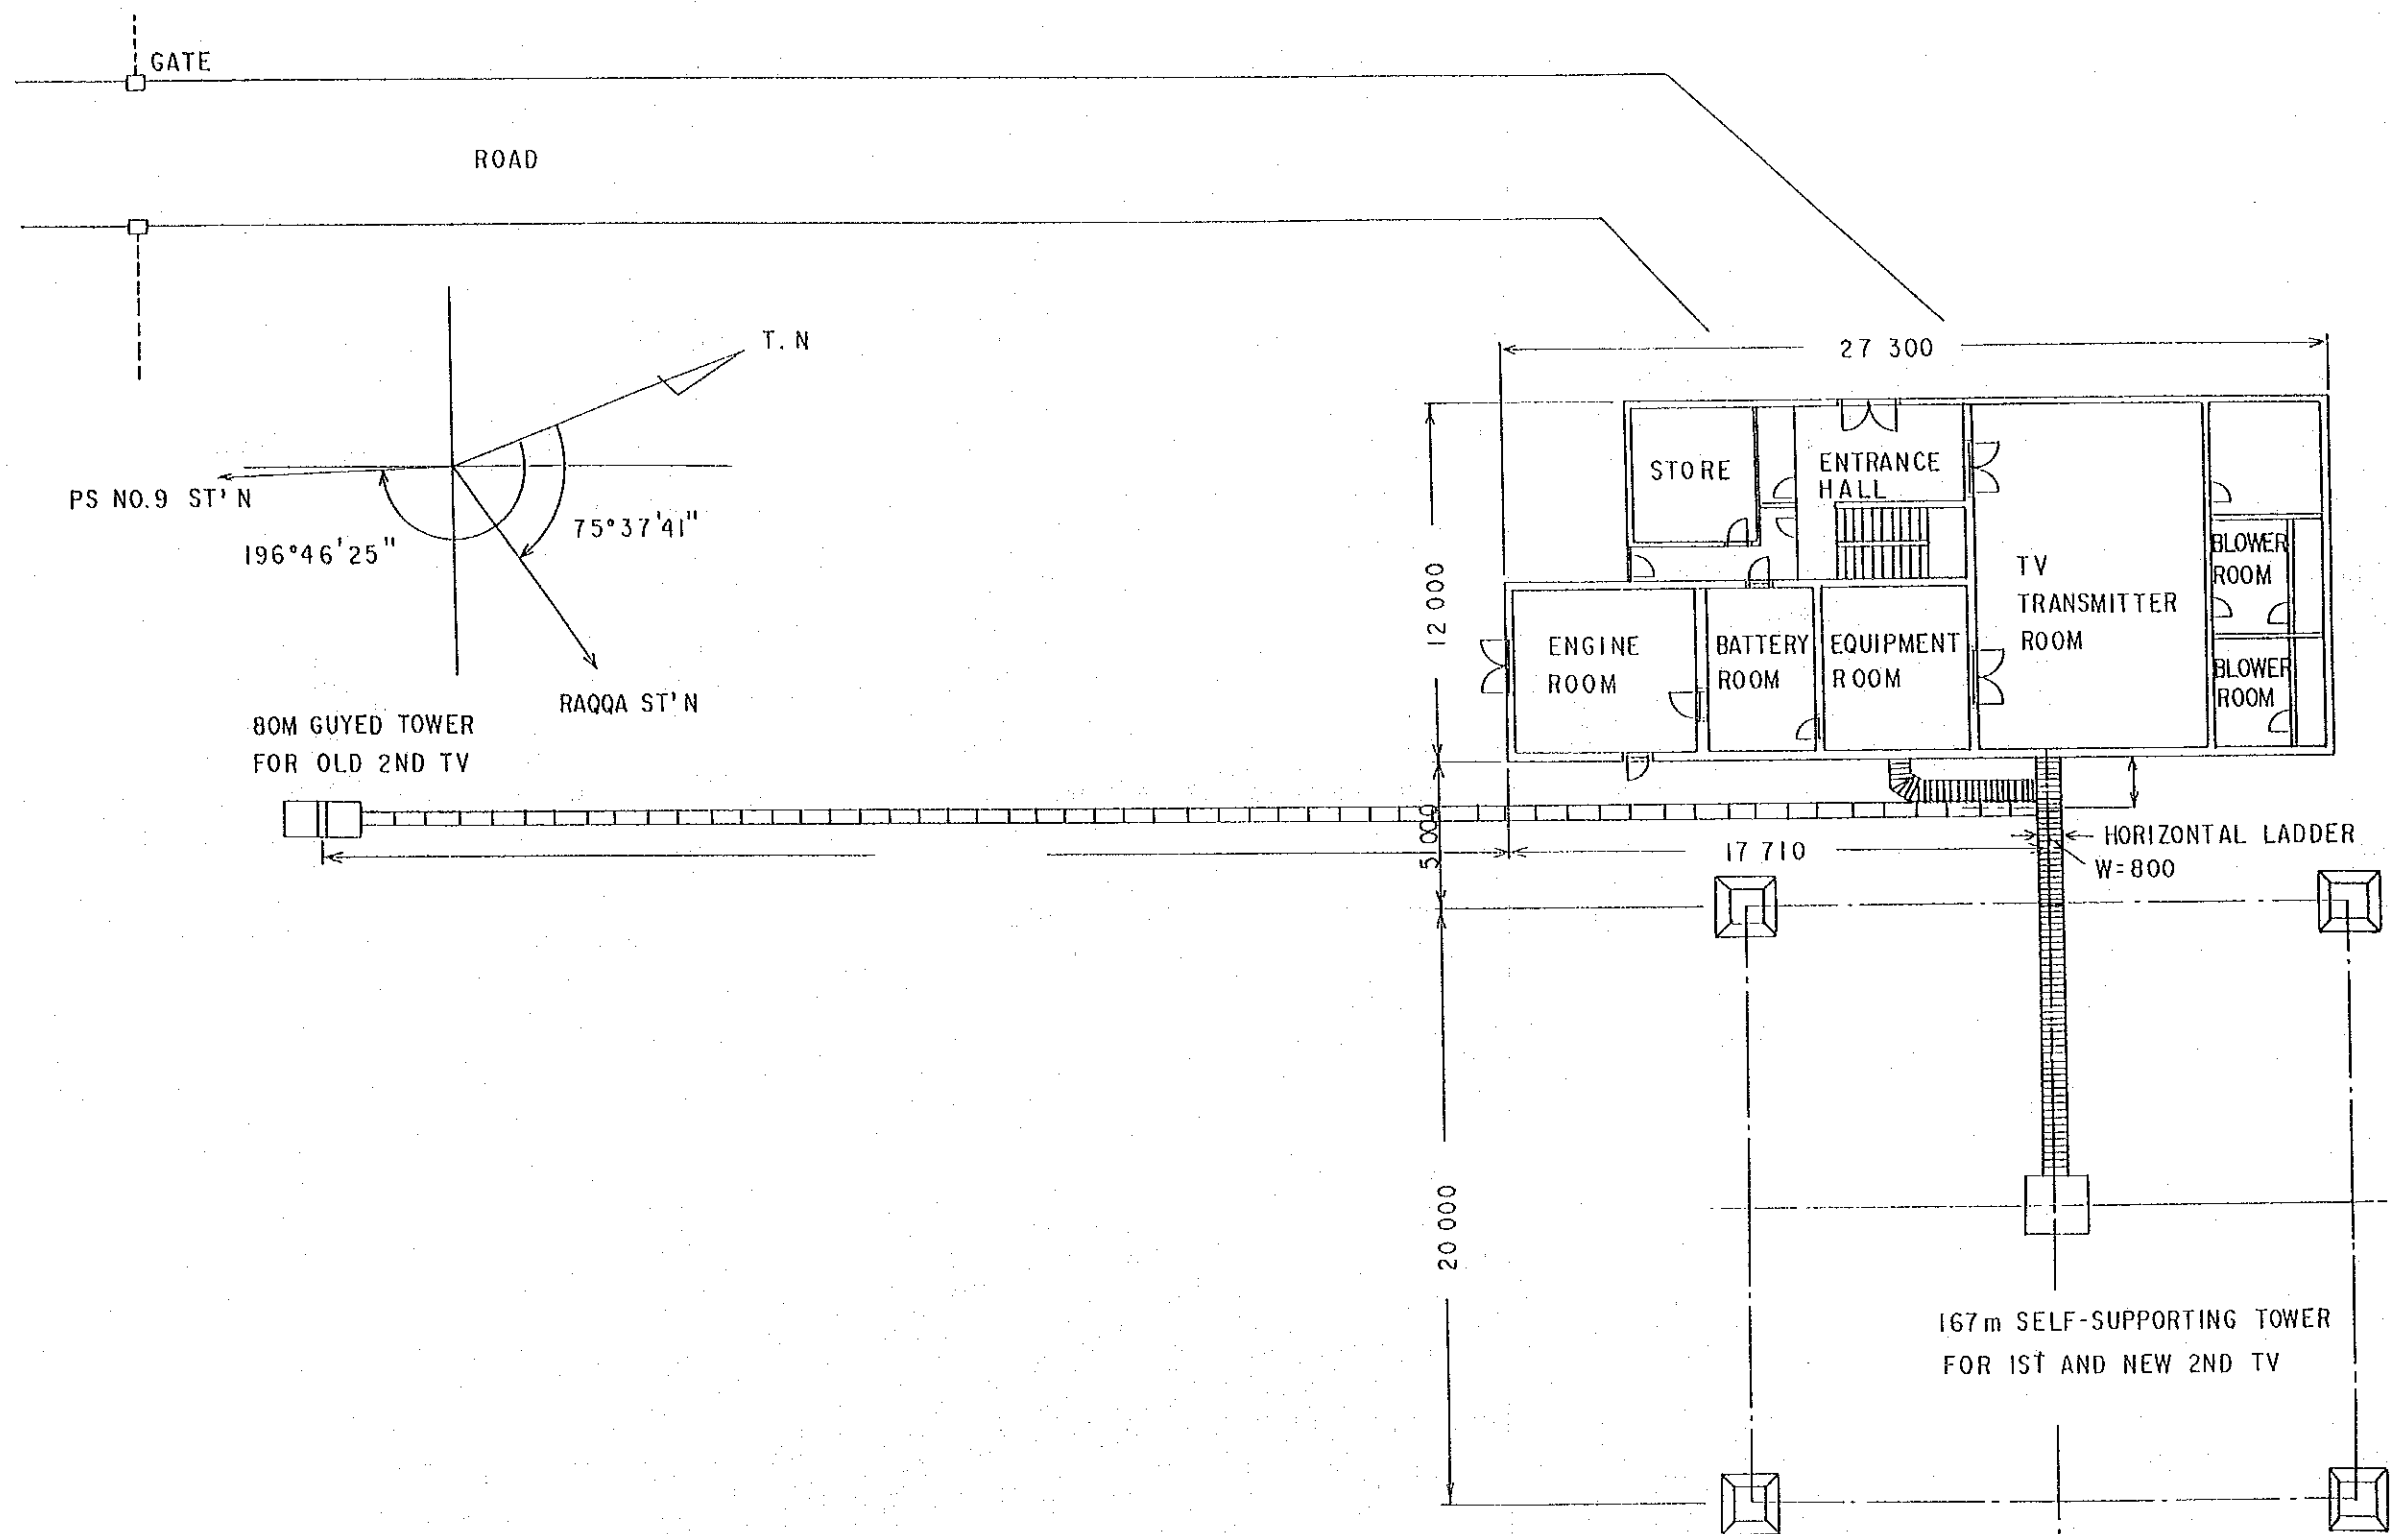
SITE LAYOUT FOR TABQUA STATION
